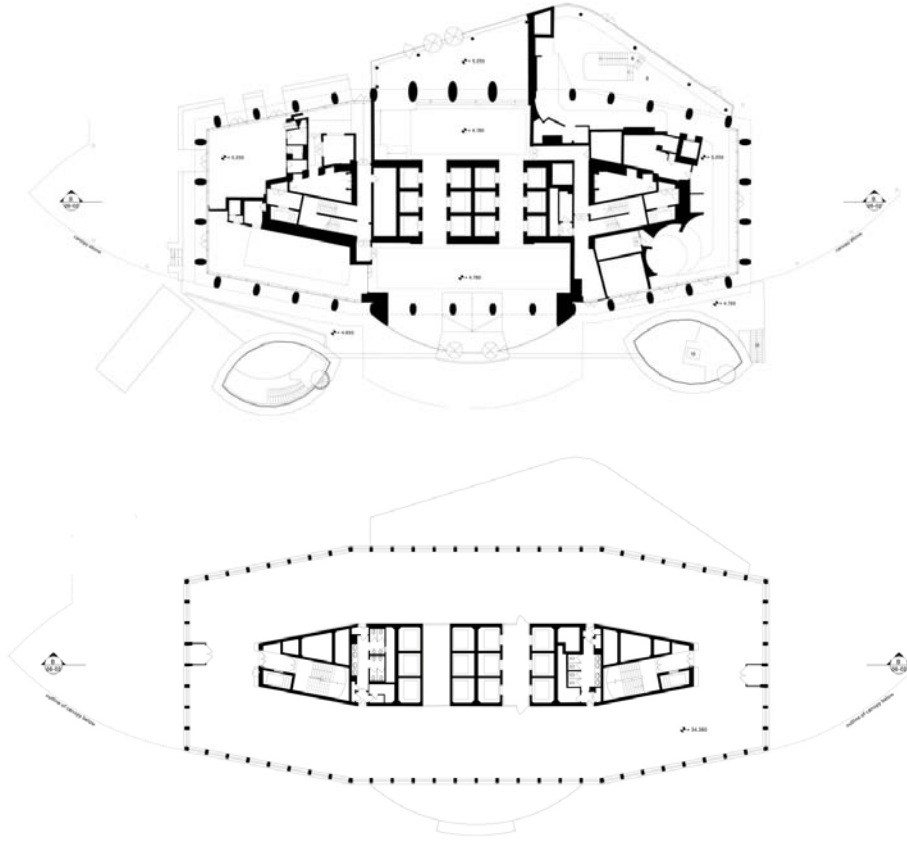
Portland House, Existing, Ground and Typical Floor Plan (DCA, 2013)
